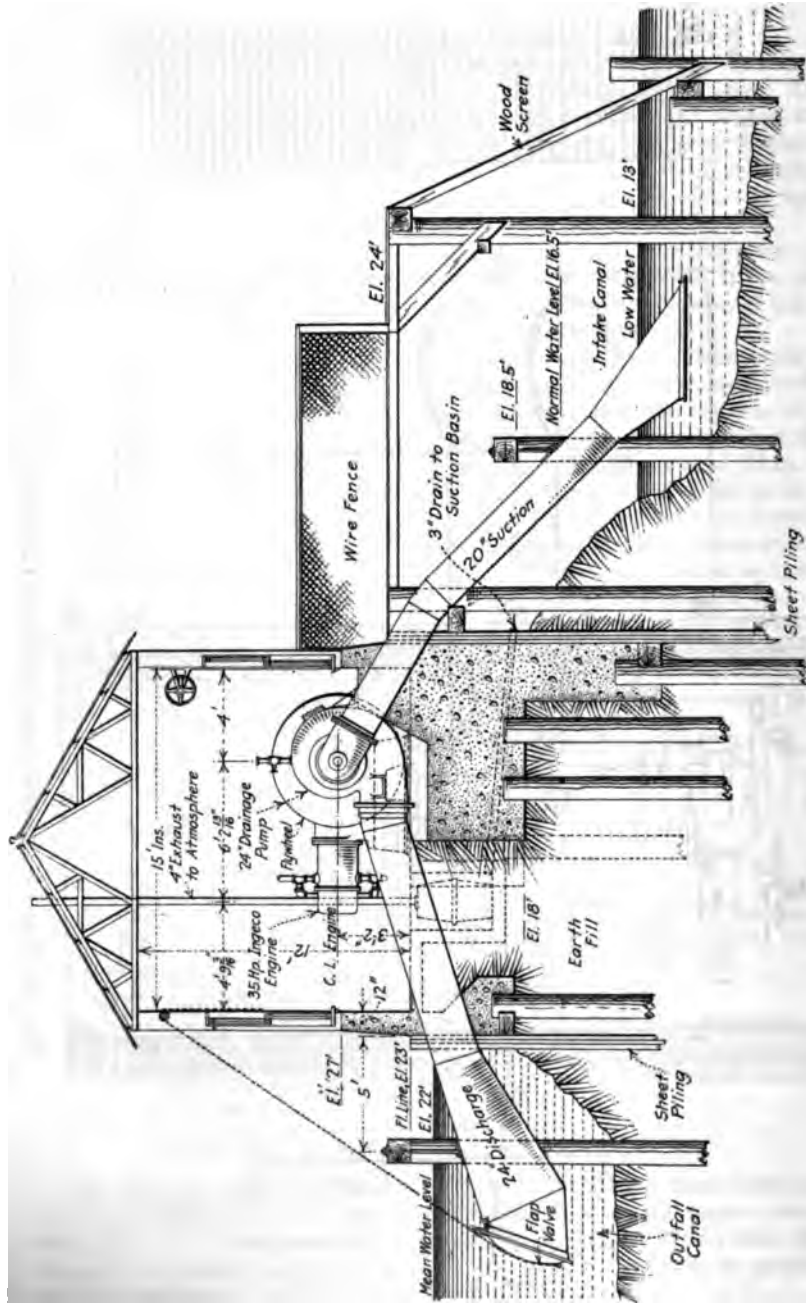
PLAN OF PUMPING PLANT, FIDELITY LAND COMPANY, DALCOUB, LA.
